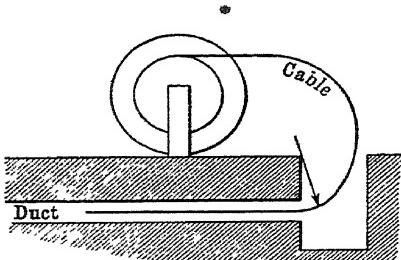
SHOWING RELATIVE POSITIONS OF CABLE DRUM AND DRAW BOX.
